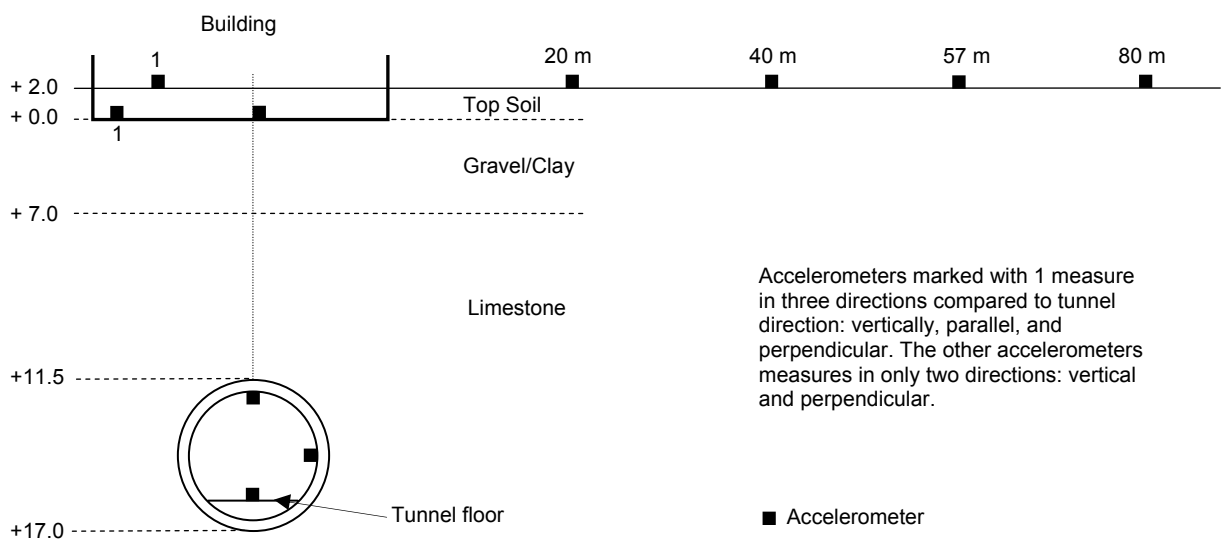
Cross section of the metro tunnel in Copenhagen showing the placement of the accelerometers and the ground conditions (modified from Citytunneln, 2000).
